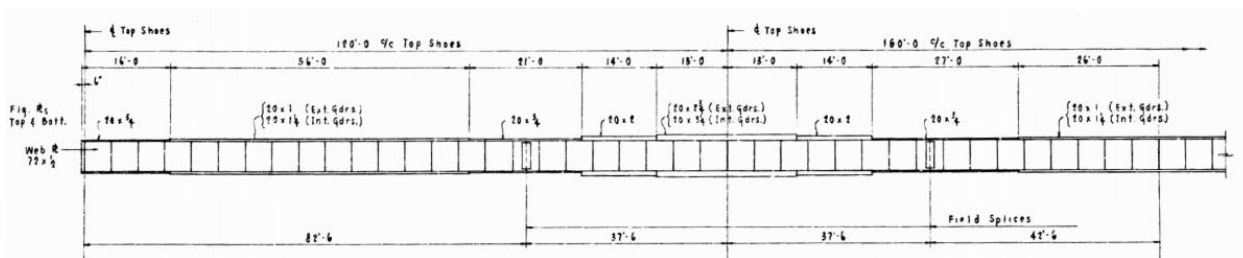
System B: Typical Plate Girder Elevation for the Bridge (NBI 33240)
